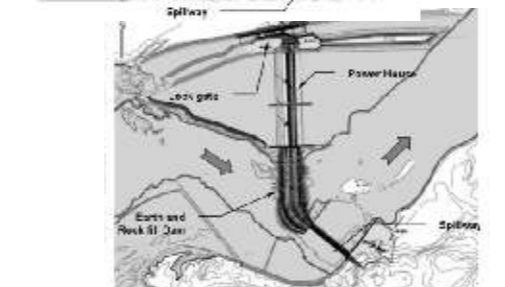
Layout Jirau Power Plant. Fig. 14. Layout Santo Antônio Power Plant.
